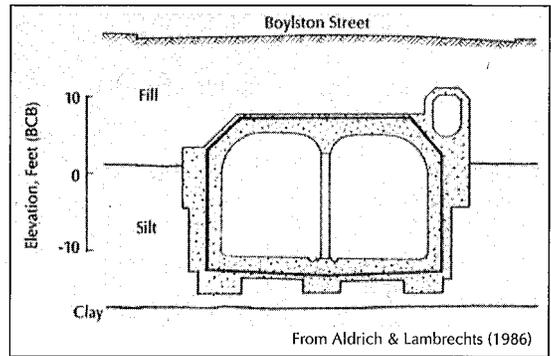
A section of the Boylston Street Subway between Berkeley and Clarendon streets at Station 58+00.
